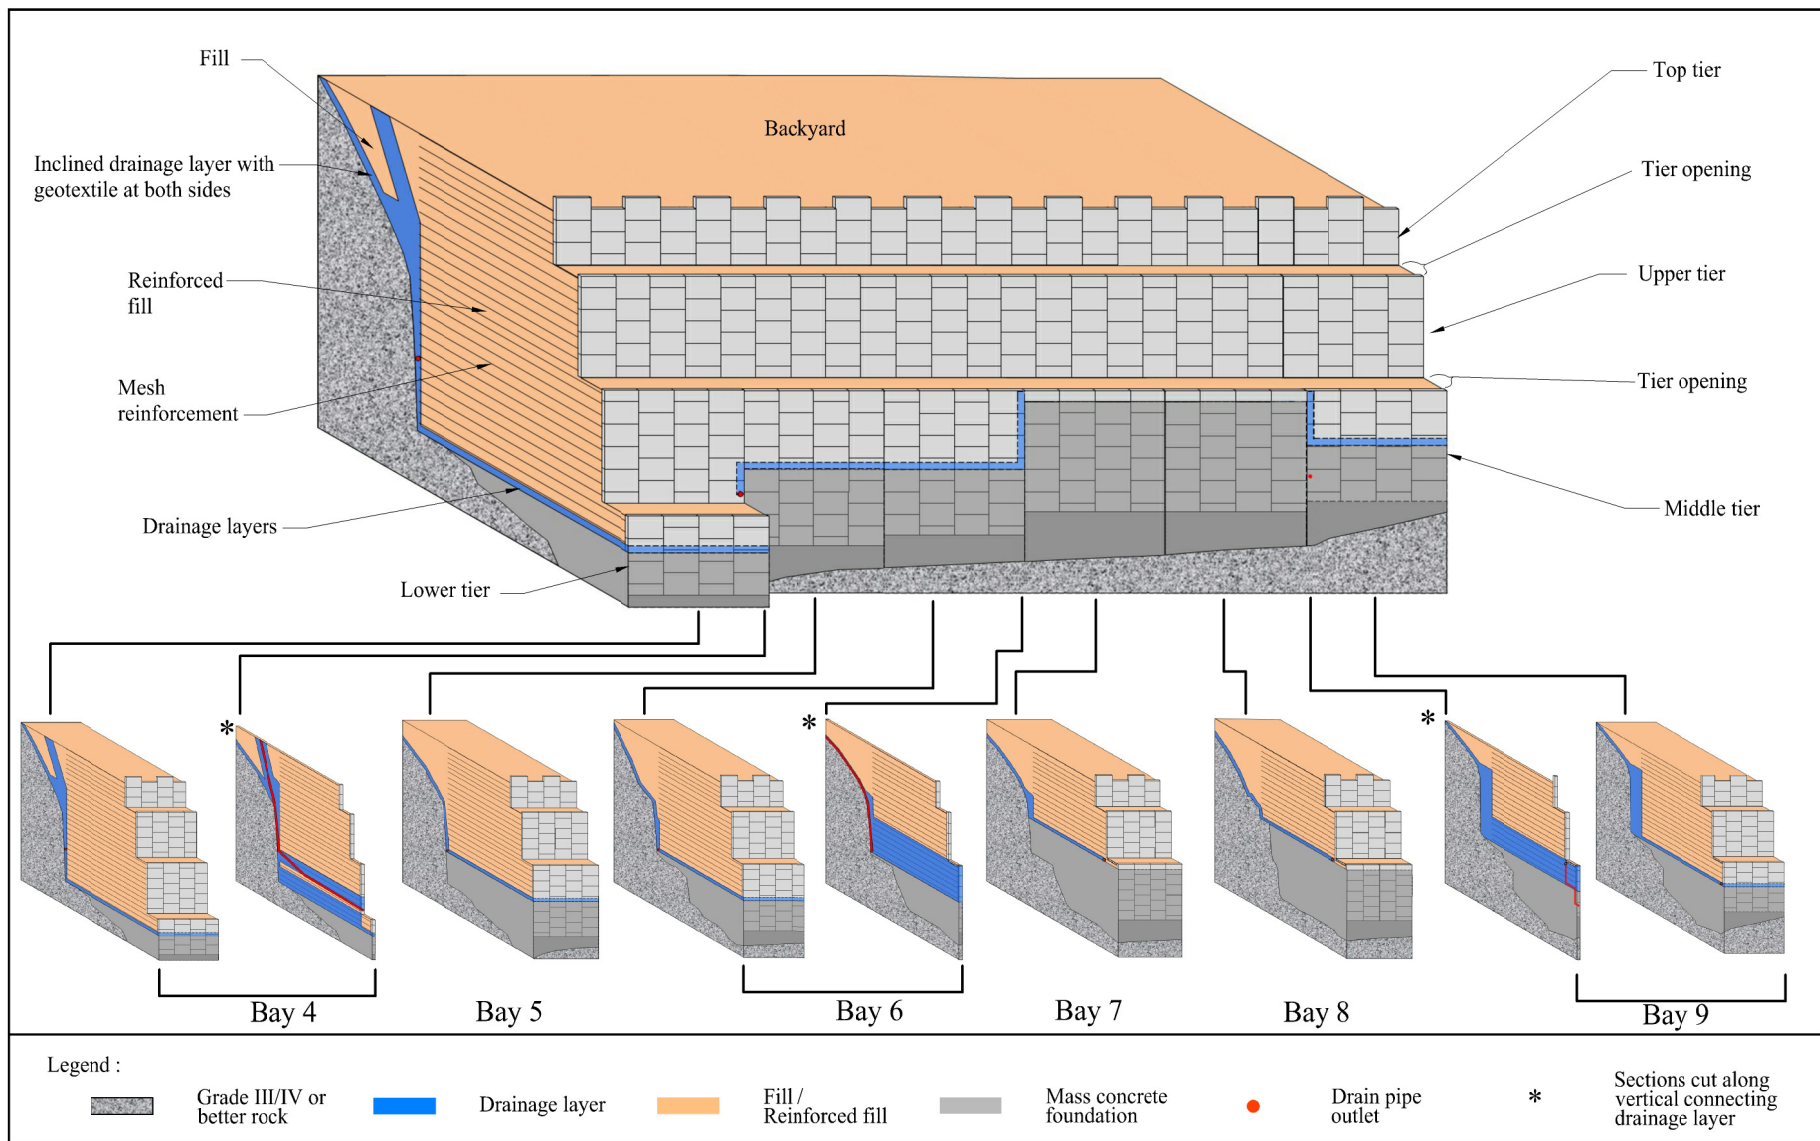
3D Spatial Arrangement of the Drainage Layers and Tiers
